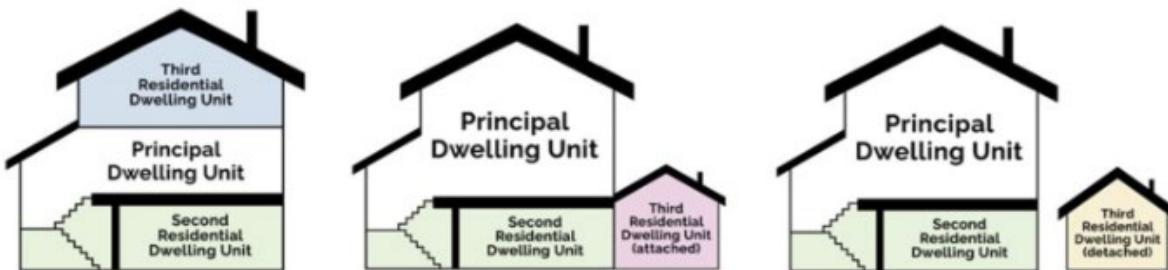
Example of ARU configurations - Image Courtesy of Whitchurch-Stouffville¹
